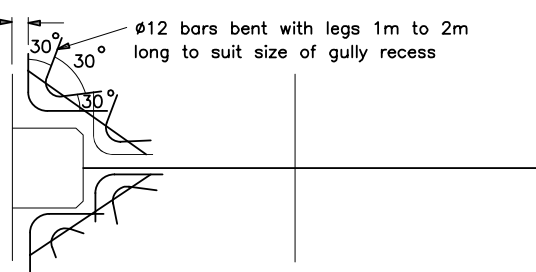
JOINT WITHIN GULLY DIMENSION
